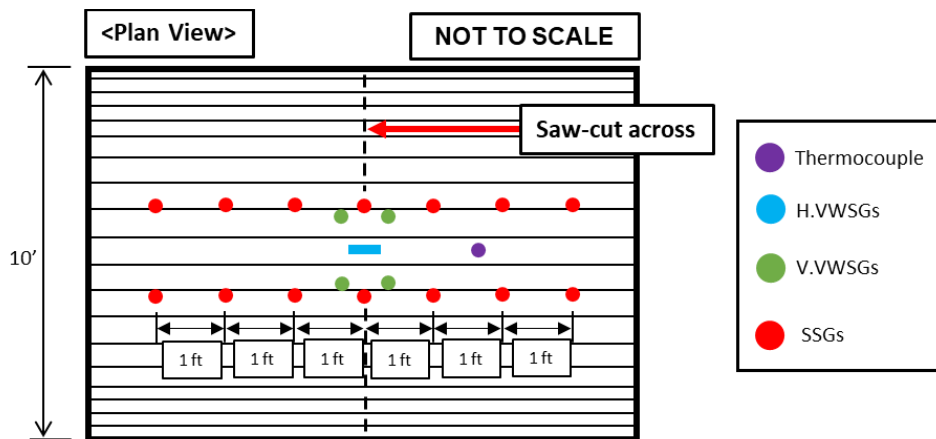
Plan view of typical gauge installation location in Waxahachie
